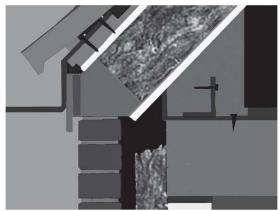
Insulation which does not continue where the outside wall meets the roof
